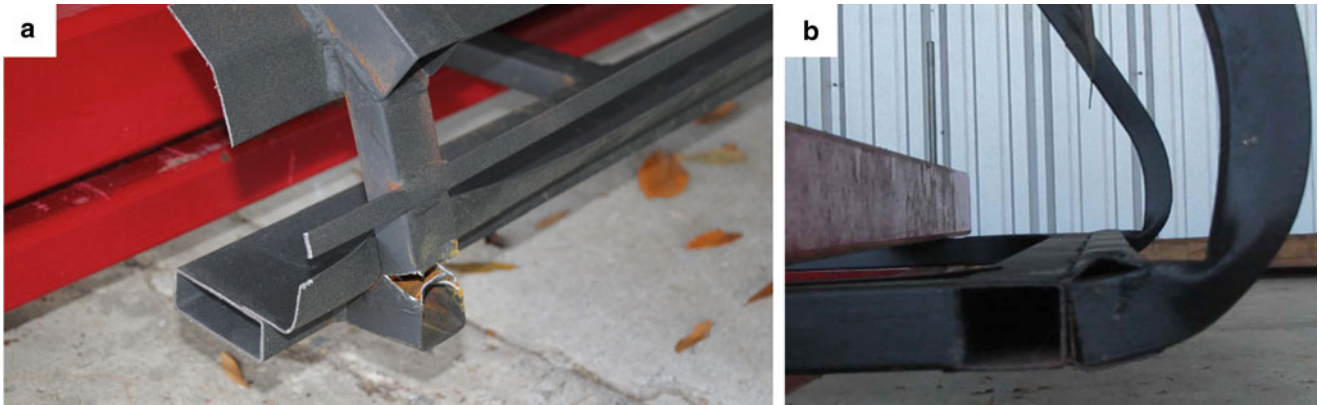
Selected failure modes (a) wall to floor connection (b) roof to wall connection
